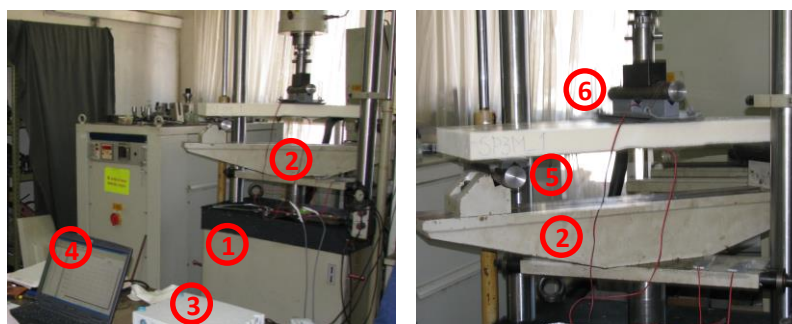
Testing machine and equipment for flexural test of sandwich specimens: 1) testing machine; 2) additional device for testing flat beams; 3) acquisition unit; 4) computer; 5) steel support lay on cylinder; 6) loading steel beam on cylinder
